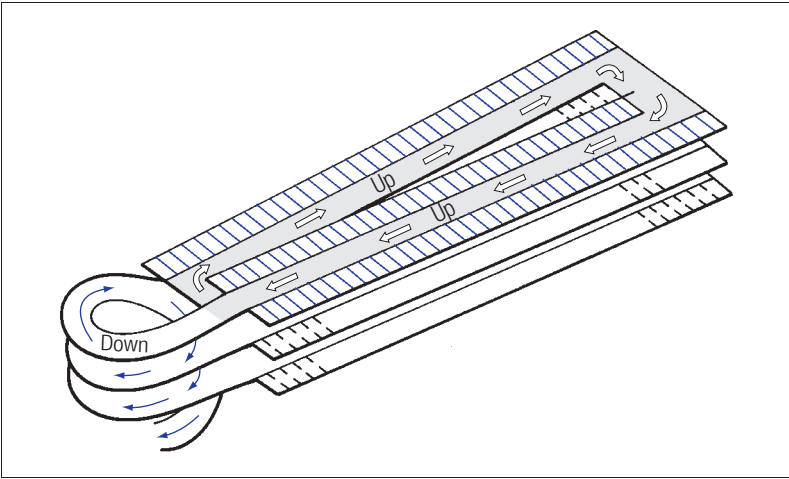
Ramped floor car park with a clearway down (departure) ramp
